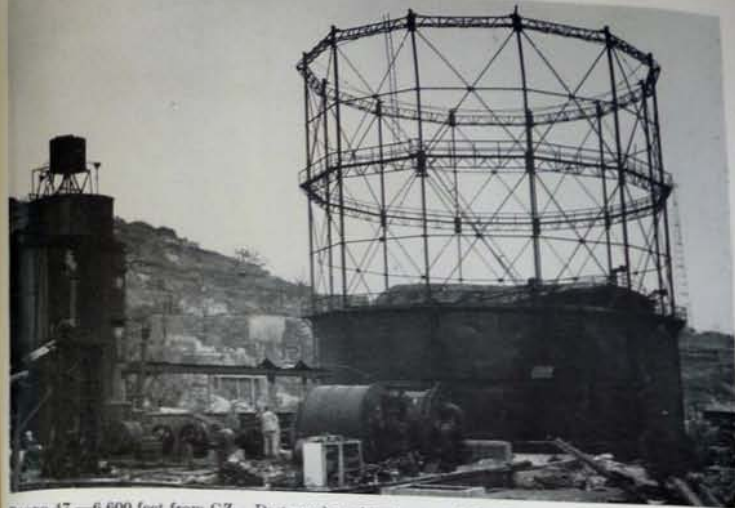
6,600 feet from GZ. Destroyed machine house and Gas Holder 1, Yachiyo-Machi Gas Works.
